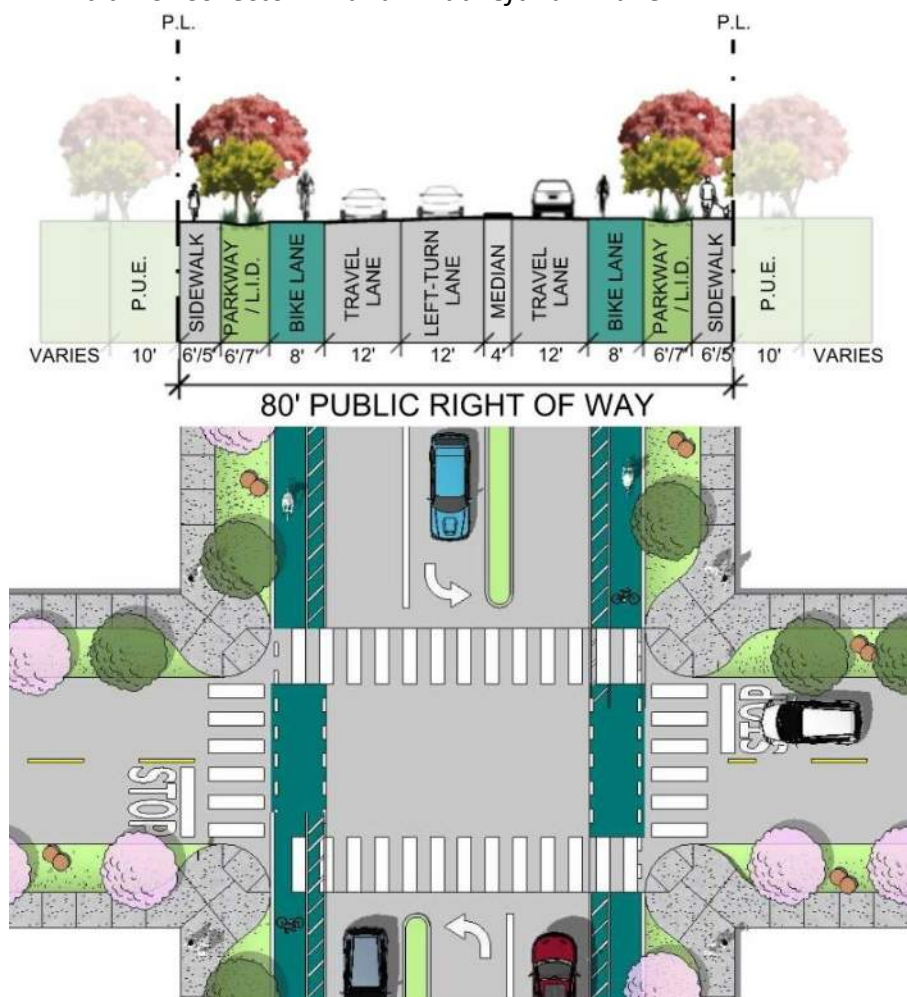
Collector 'A' Adjacent to Village Commercial
